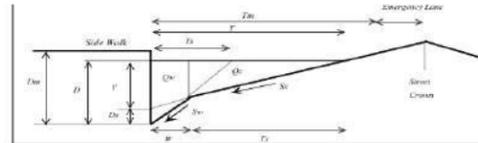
Street and Gutter Cross-Section for a Local or Collector Street (Not Drawn to Scale)
